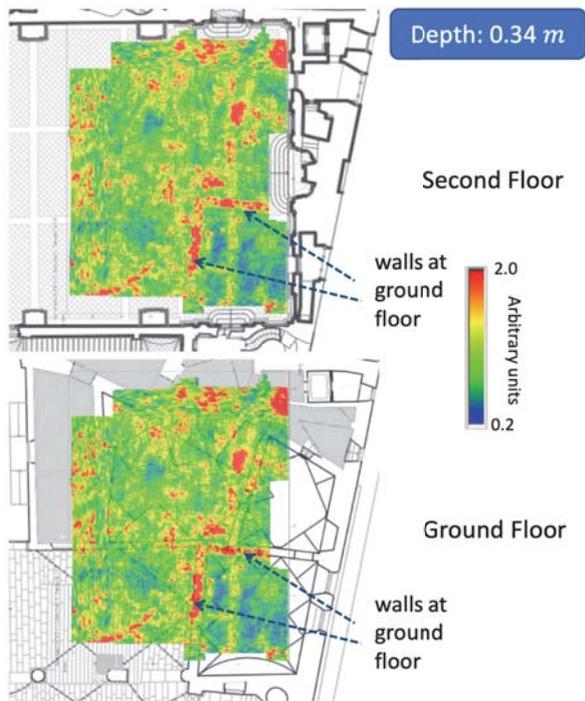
C-scan at 0.34 m superimposed to the maps of the second floor and the ground floor
